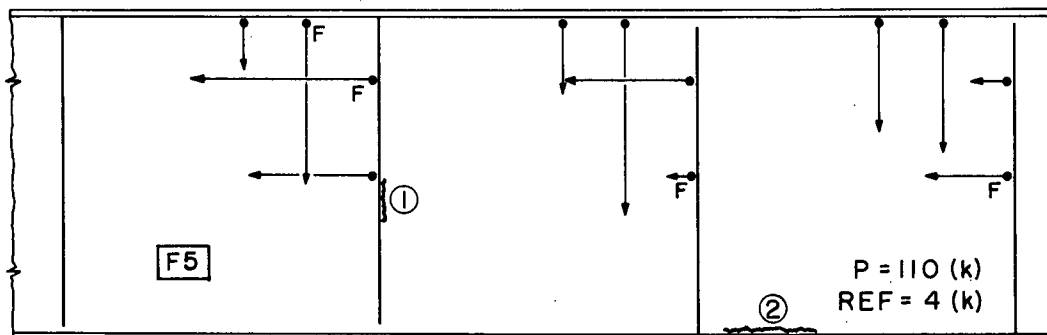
Web Stresses Normal to Boundary, Girder F5
